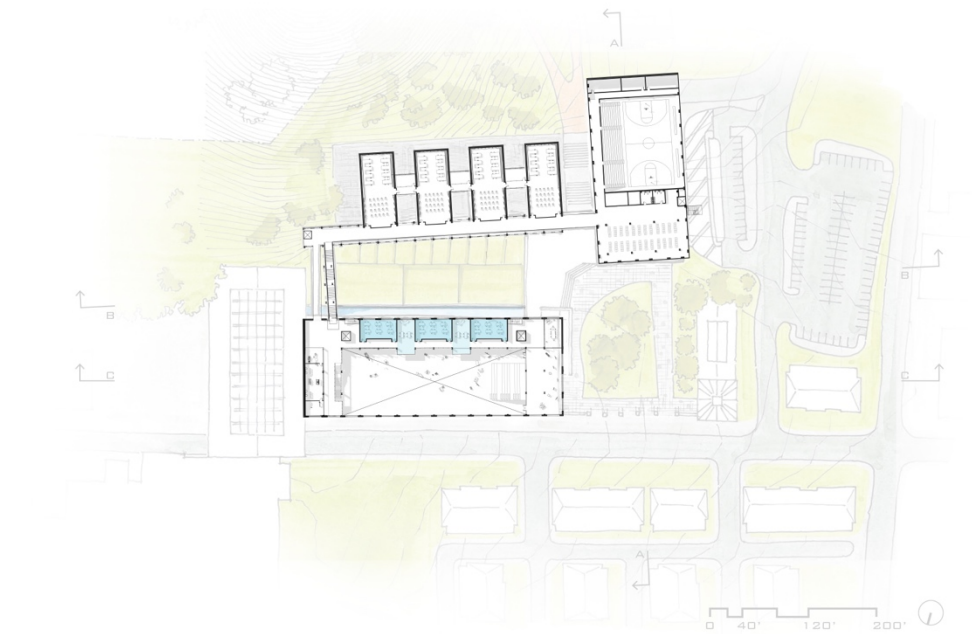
, Mezzanine Level of Tractor Building, 3rd Floor of New Buildings (Source: Author)
